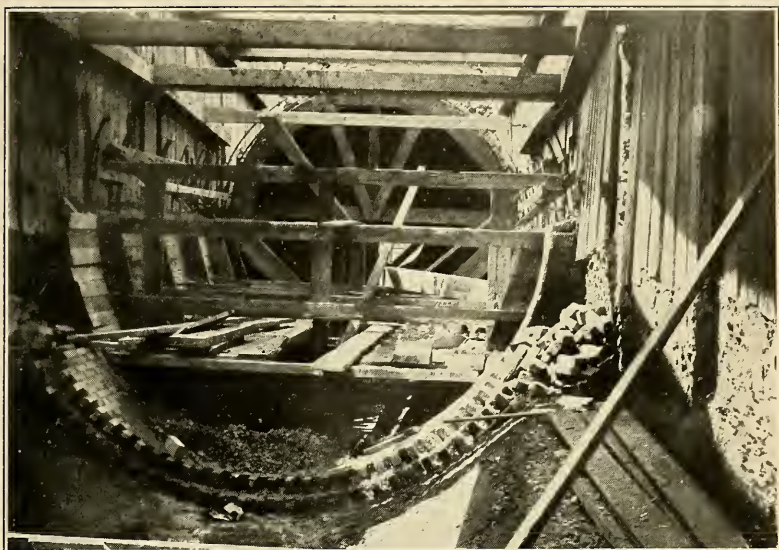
SHOWING FORMATION OF INVERT AND SIDE WALLS OF 13' 6" SEWER.
